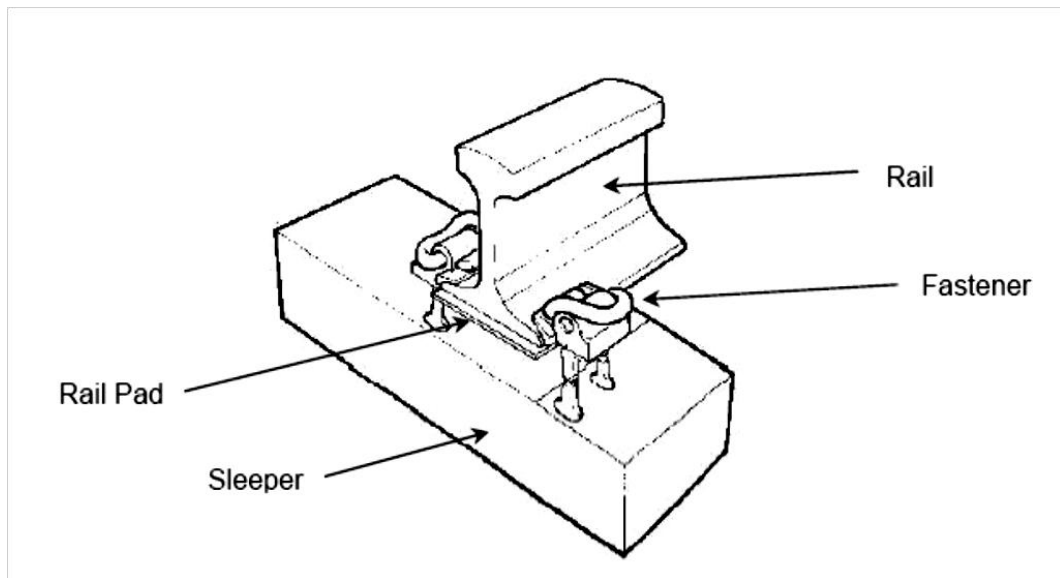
Typical fastening system for concrete sleepers [Kaewunruen and Remennikov, 2008]
